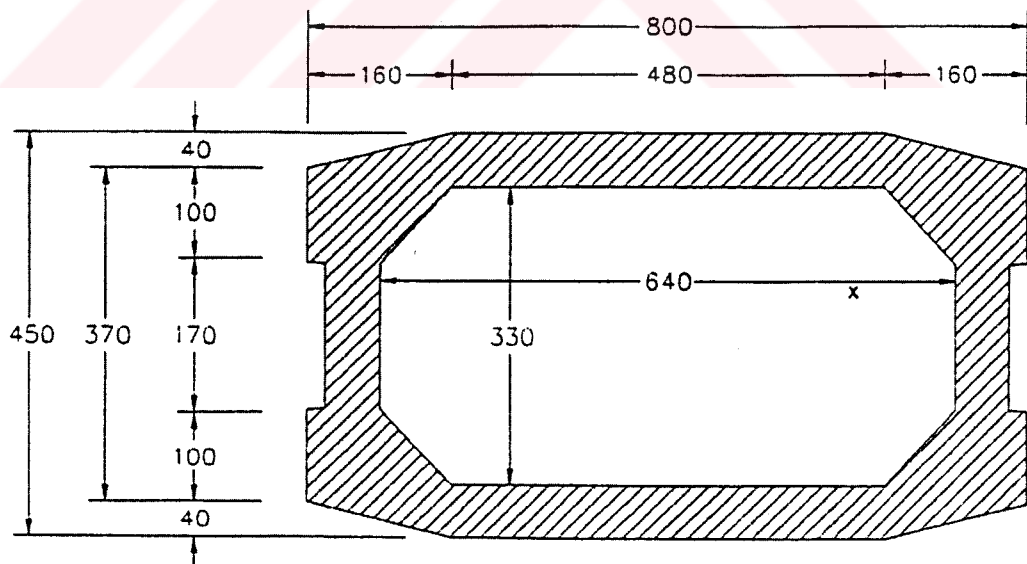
Cross Section of a Typical Pier (dimensions in cm)
